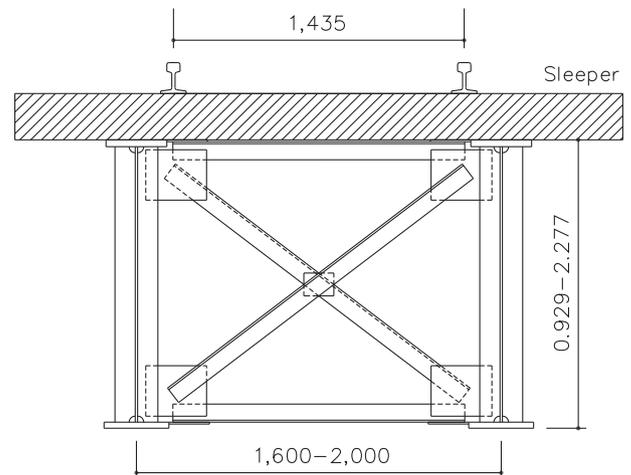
Typical cross-section of a study bridge (unit: mm).
